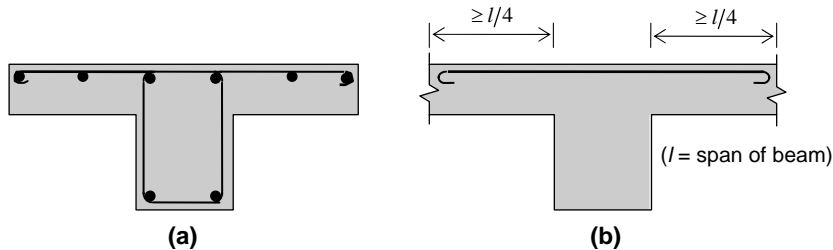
Detailing of flanged beams to ensure integral action of slab and beam.
